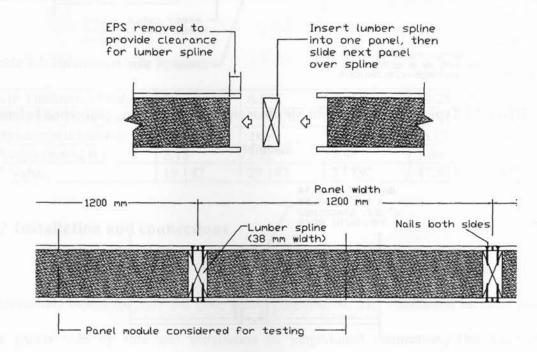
Typical section at panel lumber-spline connection before and after assembly
